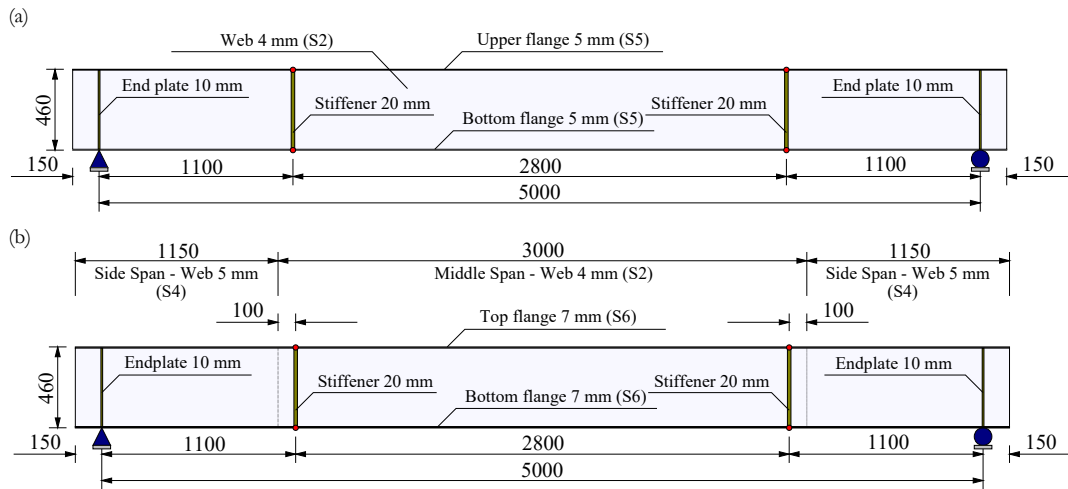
Dimensions and materials of tested beams. (a) Test-1. (b) Test-3 [23]
